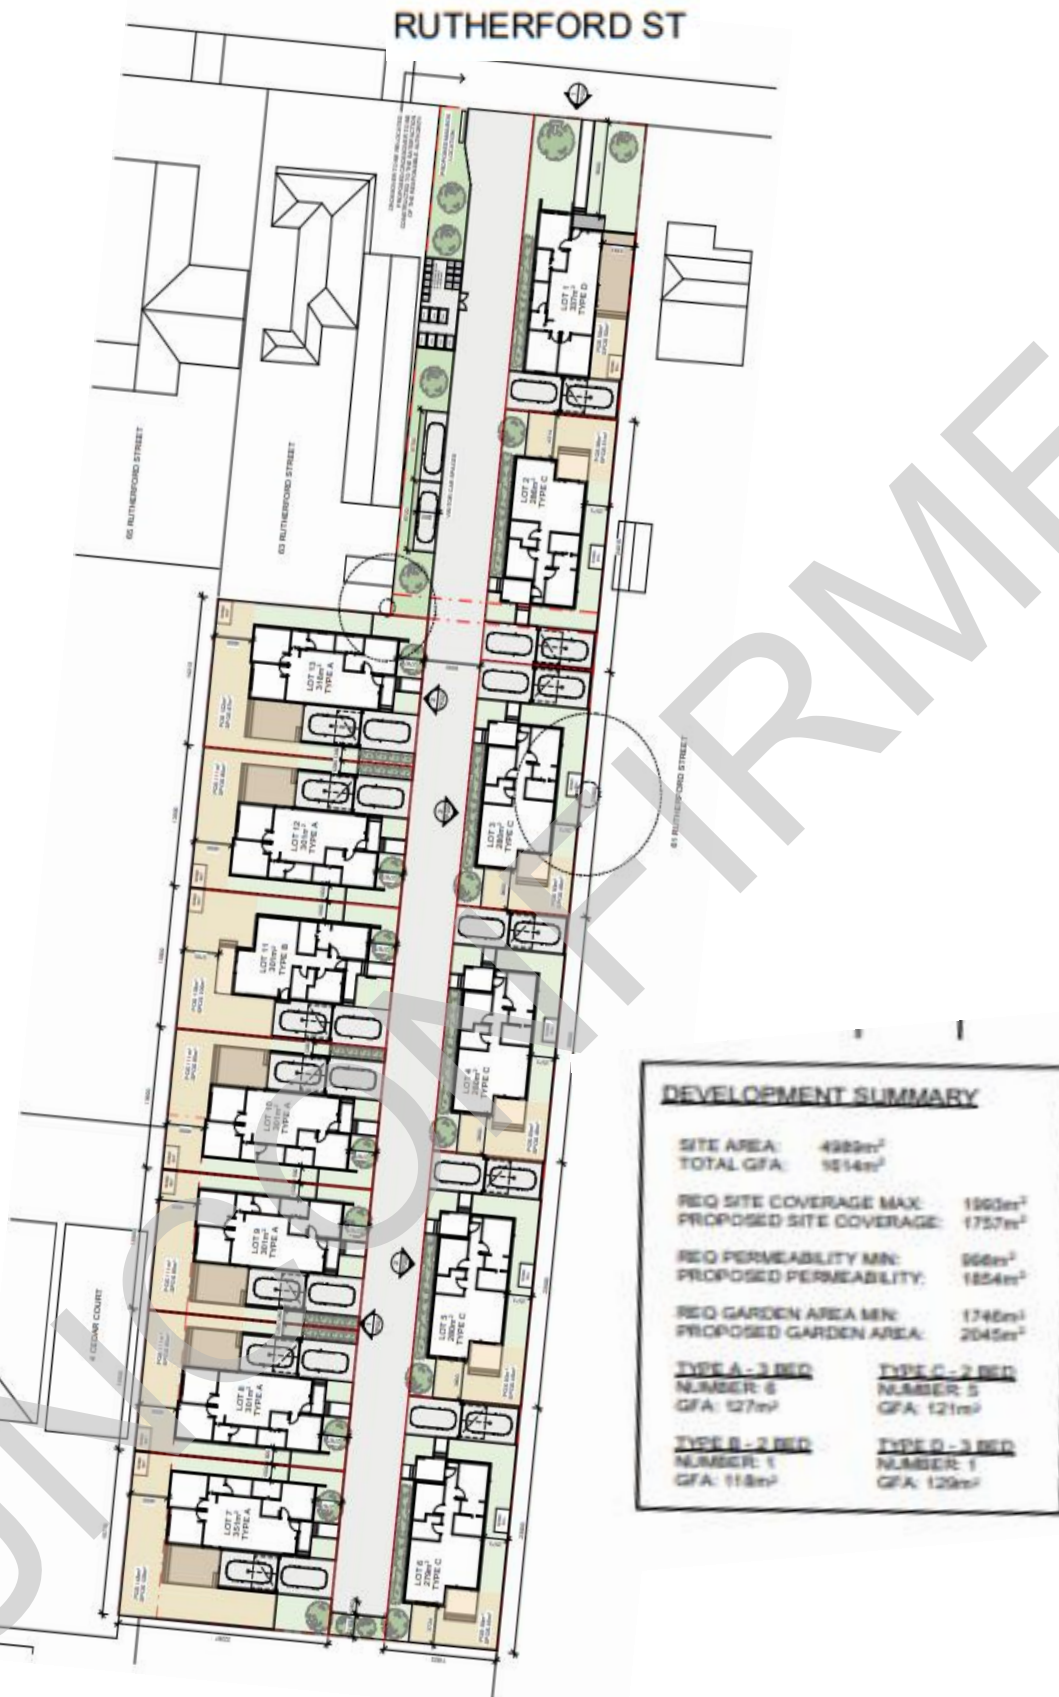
Proposed 13 dwellings and 13 lot subdivision PLN2024096
